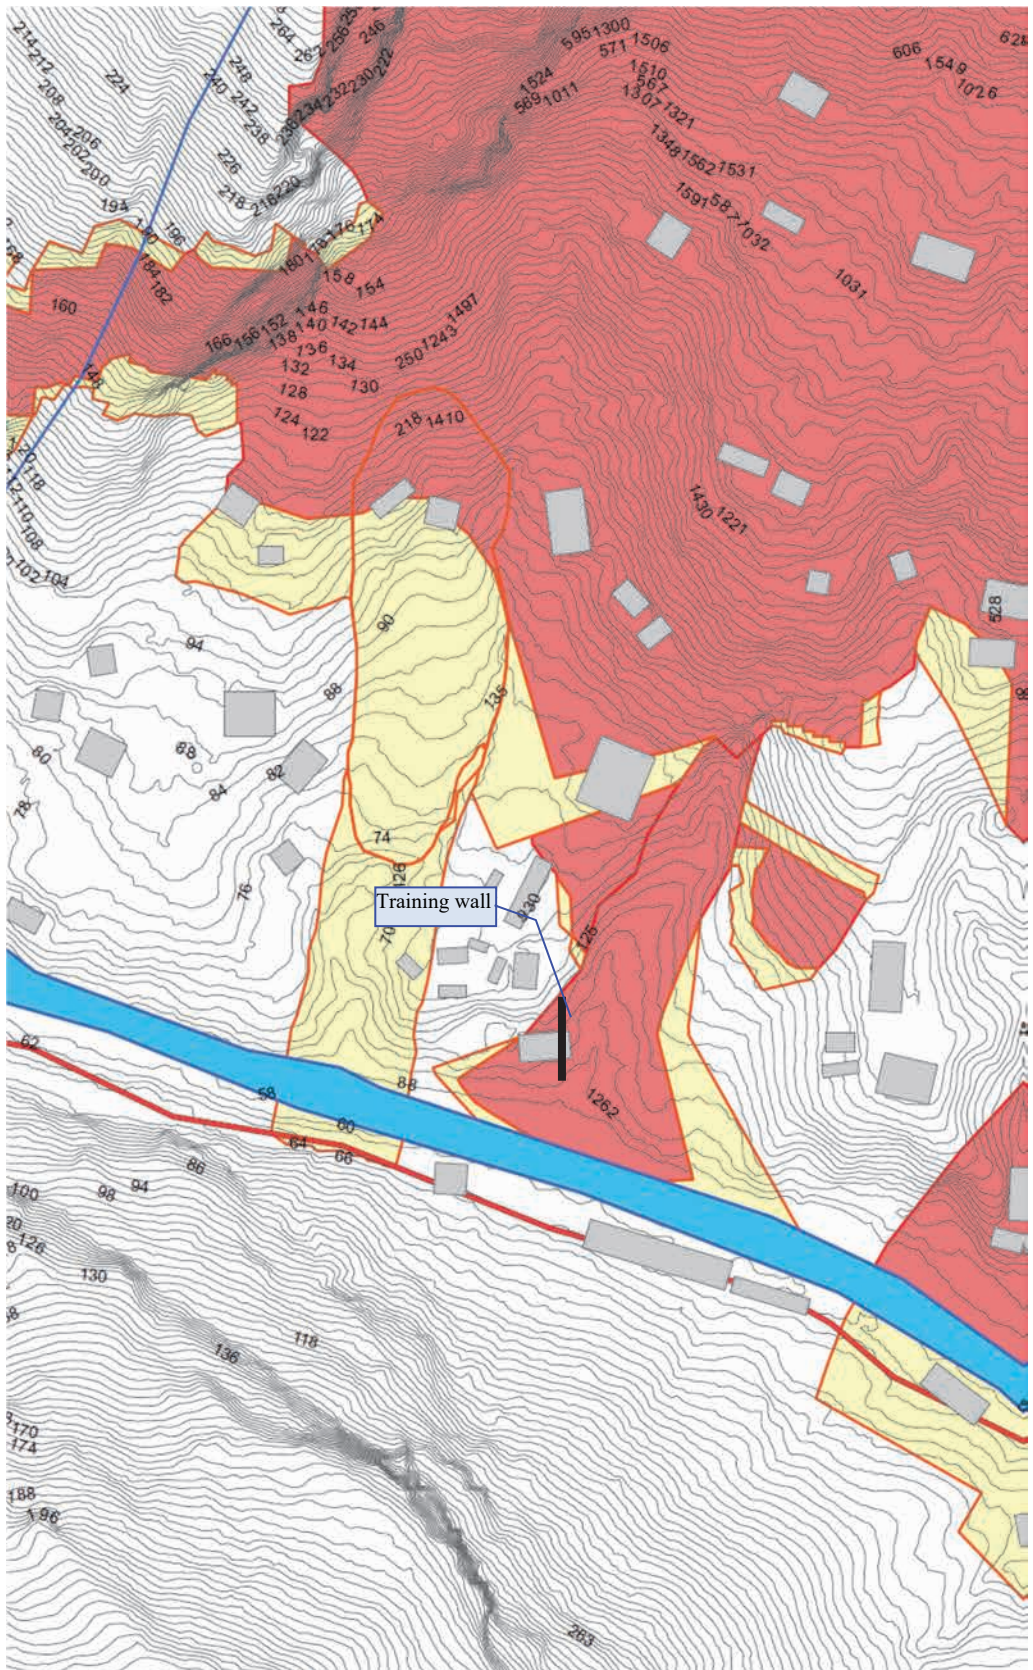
Layout of the Planned Structural Measures for Site 1 in the Udapotha Pilot Site
